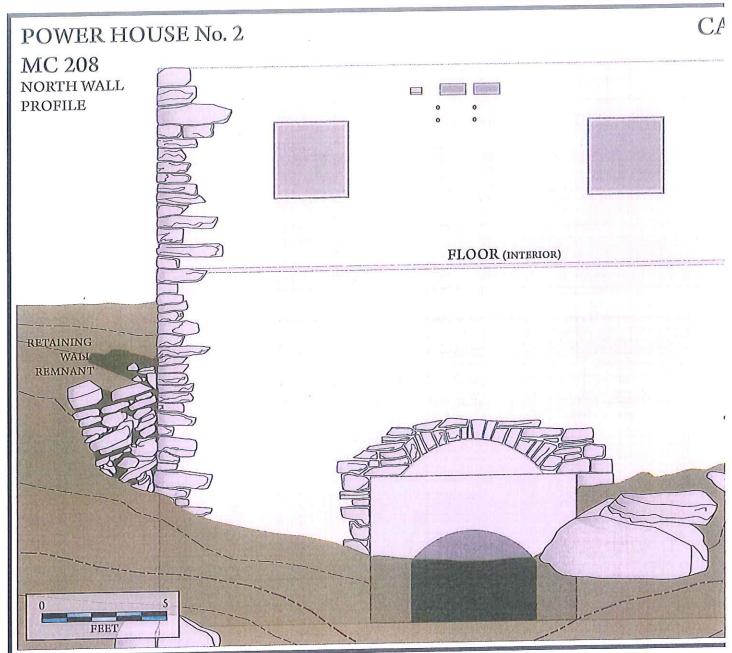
North wall profile drawing of Power House No. 2 at MC 208.
